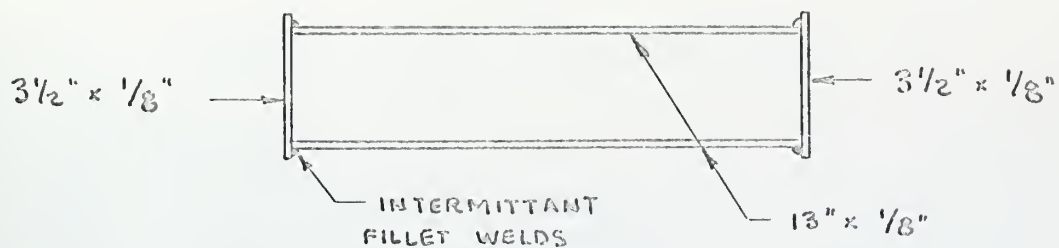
BOX GIRDER TEST SPECIMEN.
